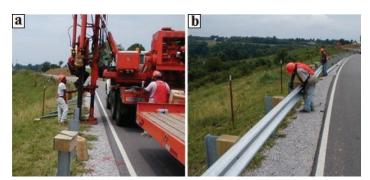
Steps in Installation: a. Post driving; b. Guardrail Mounting (7)
